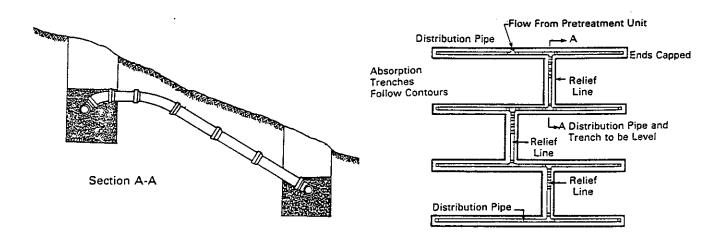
Cross section and plan view of serial distribution. The relief lines can be at the end of the trenches. There is no opportunity to rest a trench (EPA, 1980).
